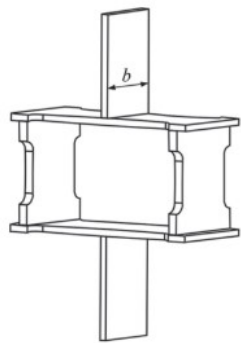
Single-sided fillet weld connection (Tuominen et al. 2018)
